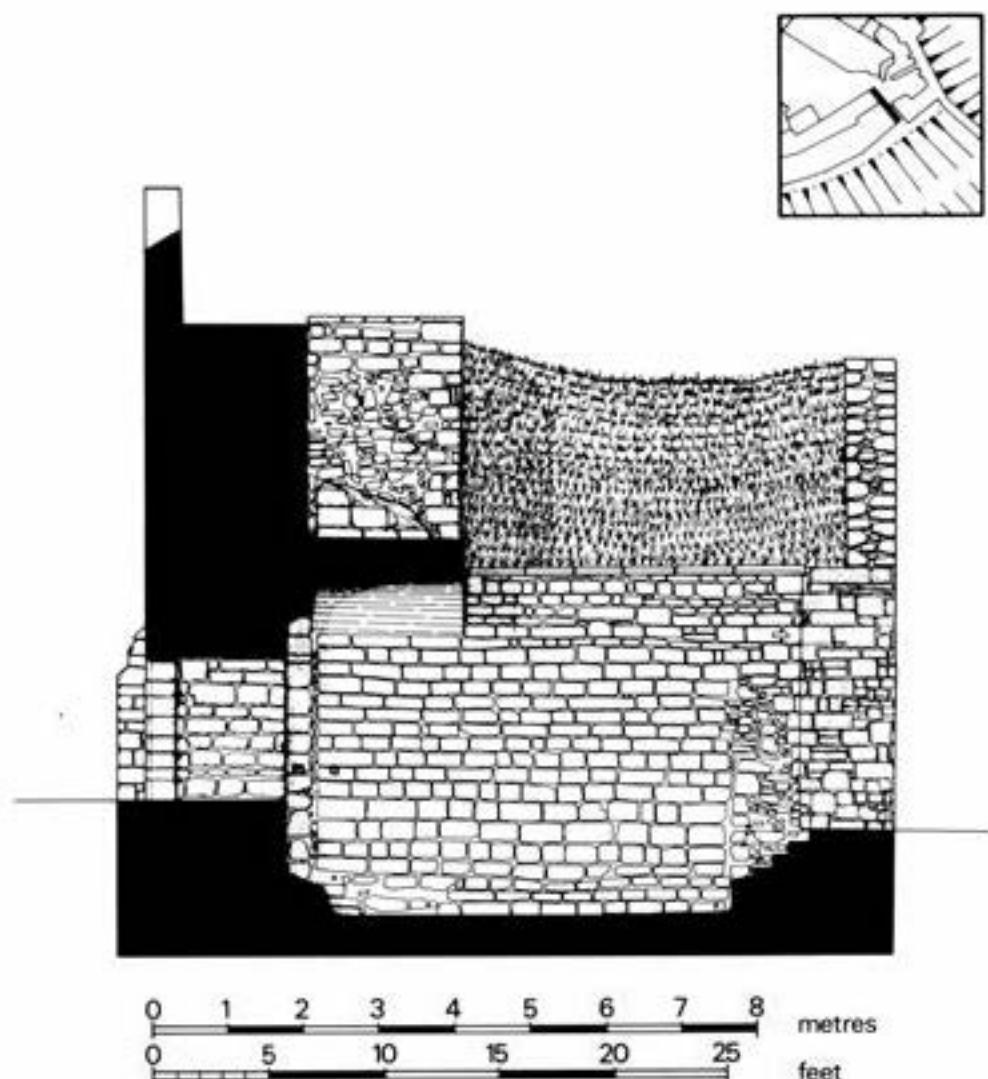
The curtain wall; north-south section through the inner ward curtain wall and the Dacre postern gate passage
